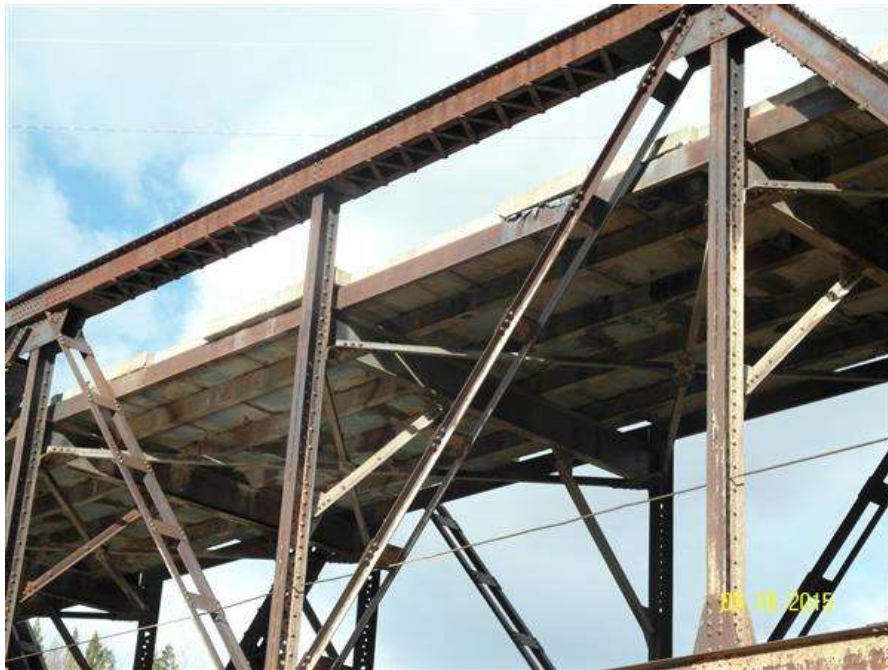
MTA-SR-001, SUN RIVER BRIDGE, PHOTO BY GARY GRASSEL. THIS IS A VIEW FROM UNDERSIDE OF THE BRIDGE, NOTE THE PRECAST DECK PLANKS HAVE SHIFTED UPSTREAM AND DOWNSTREAM AND DO NOT PROVIDE LATERAL STABILITY TO STEEL STRINGERS AND THEREFORE SUPPORT BEAMS ARE ALSO FULLY UNBRACED. (03/18/2015)
